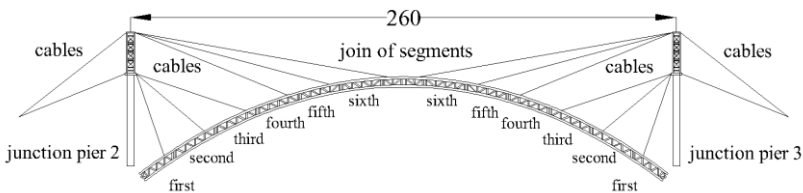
Arch bridge cable-stayed fastening-hanging cantilever assembly plan
